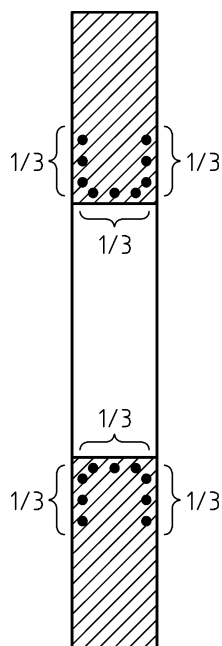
Arrangement of the horizontal reinforcement above and below the opening
